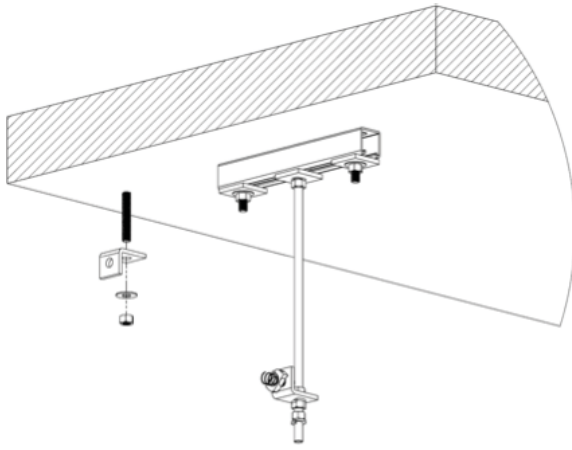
Secure a Two-Hole 90° Strut Fitting to the Anchor, Flat Against the Concrete Slab
